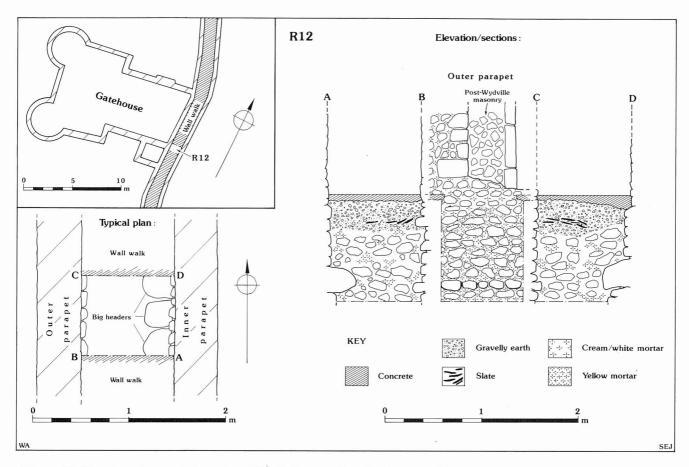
Plan, location, and elevation of Site R12 on wall-walk above gatehouse
